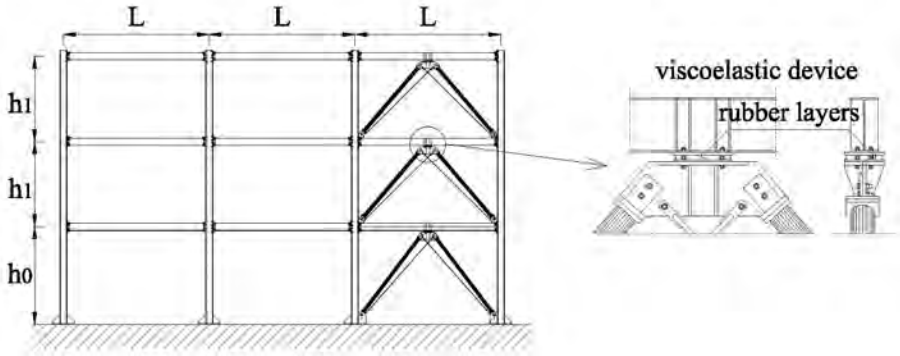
Elevation of the 3F frame with dissipative bracings and details a viscoelastic damper.
